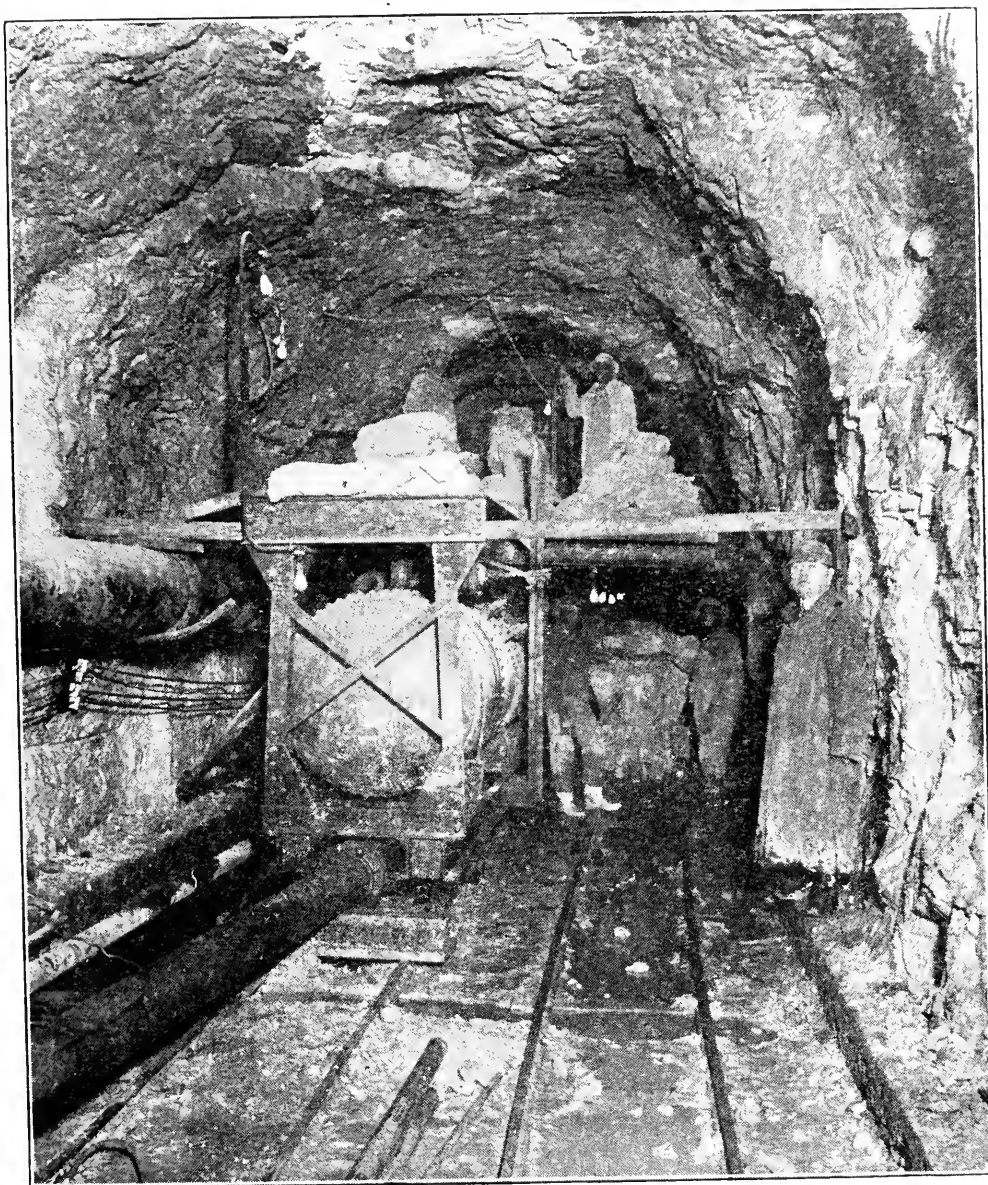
Rear end of concrete mixer and air tanks, showing 8-inch pipe through which mixed concrete is shot to the forms.
